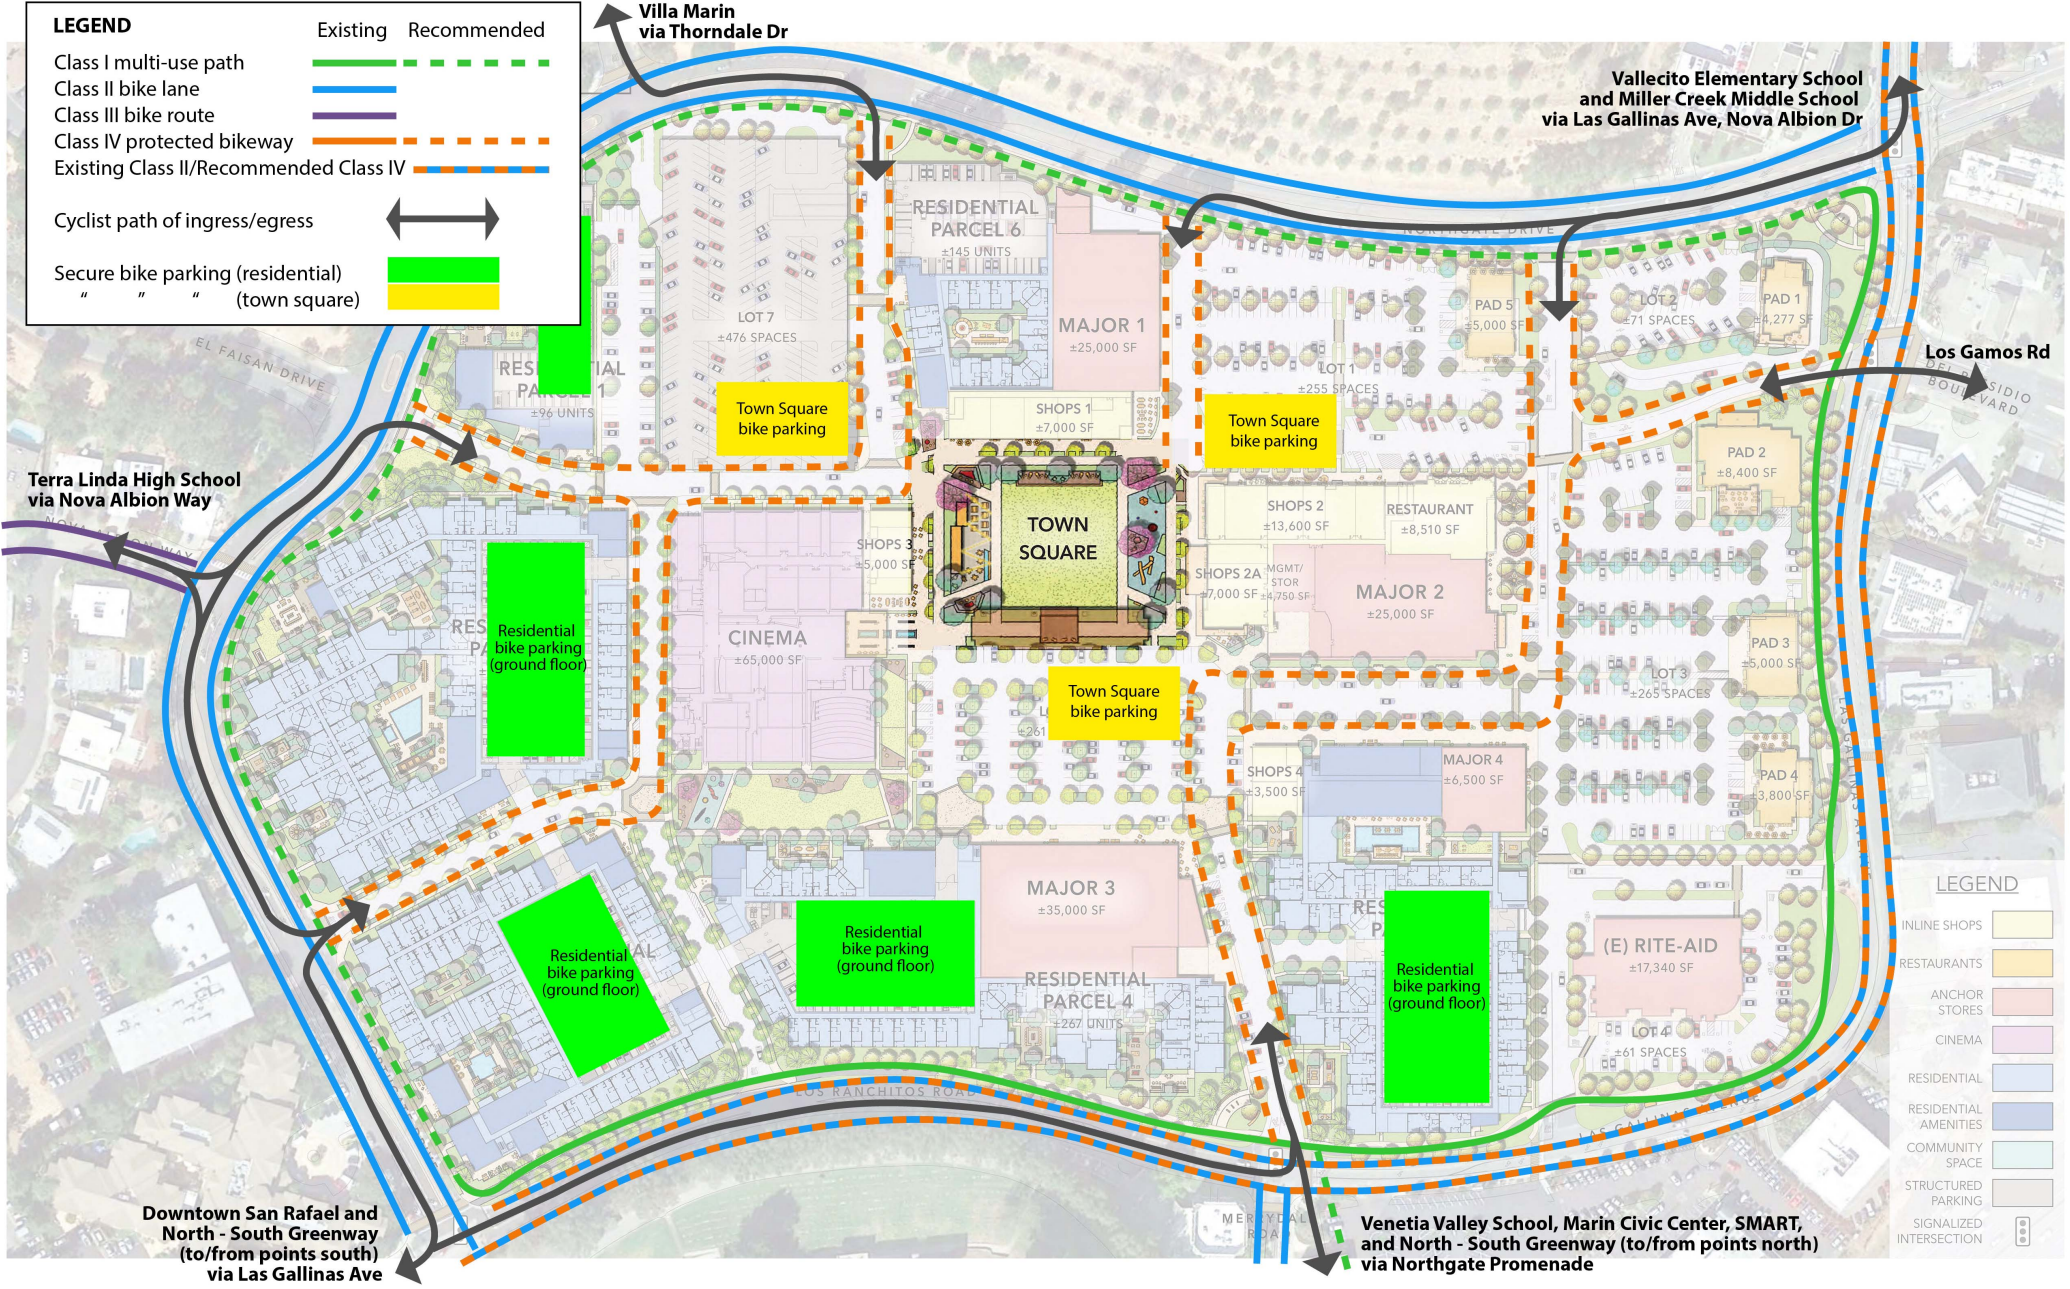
Site Plan with recommended bicycle facilities and regional connections
